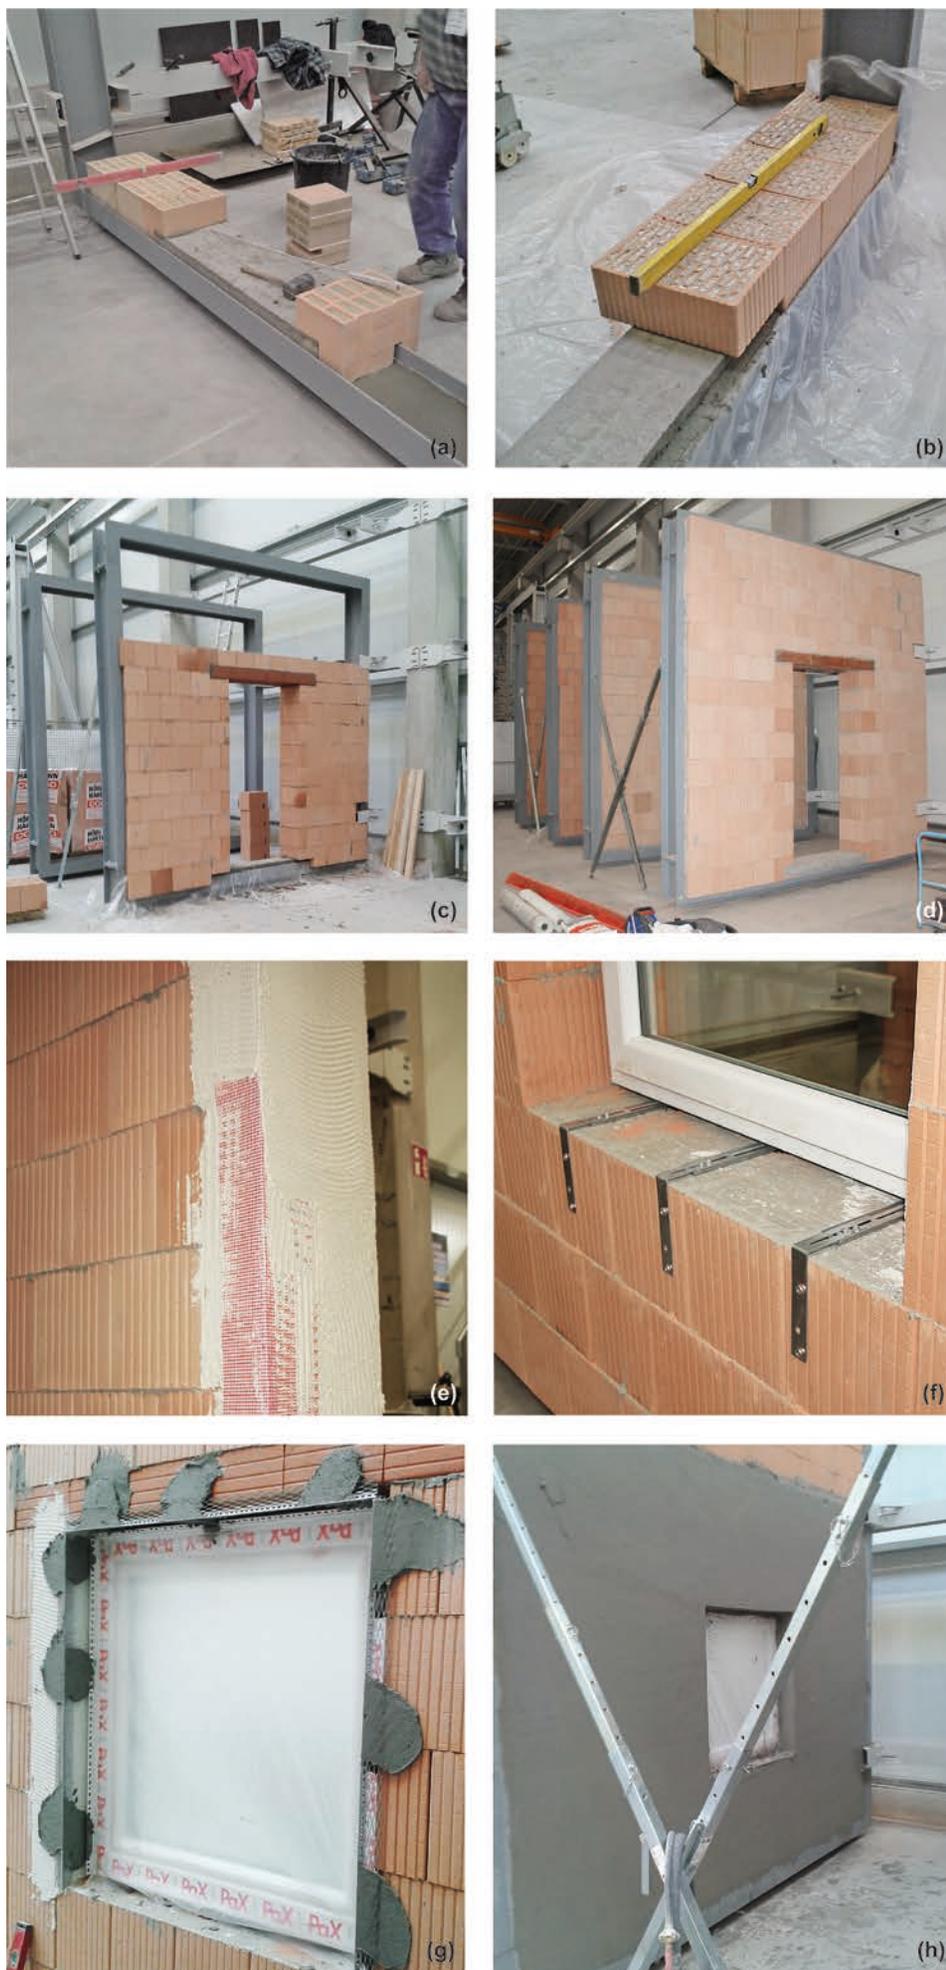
Steps building the wall. (a) wall construction with large-chamber clay masonry units; (b) wall construction with thin-web clay masonry units; (c) wall building; (d) completed masonry; (e) reveal with reinforcing textile mesh in reinforced render; (f) mounting of the window; (g) setting the render corners; (h) completely rendered wall
